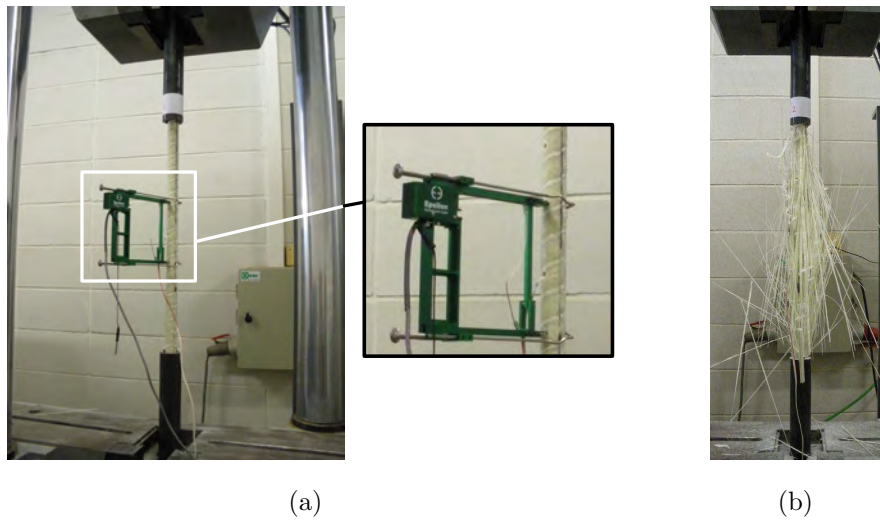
Tensile sample to measure rebar mechanical properties; (a) Glued sample placed on testing machine with visible drilled holes and (b) final failure mode.
